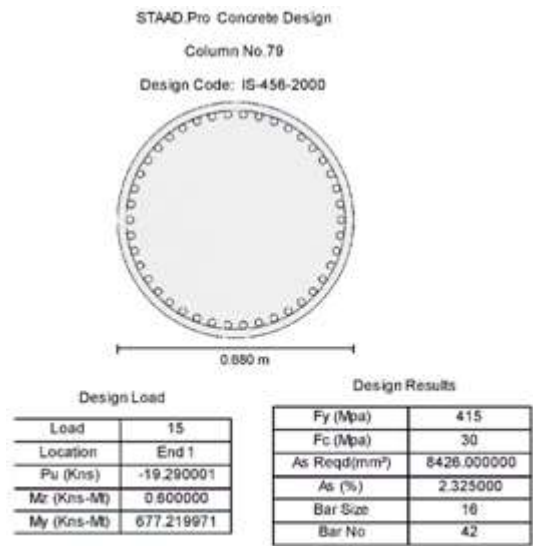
Reinforcement details of column No.79 (Tank with full water condition in Seismic Zone IV)
